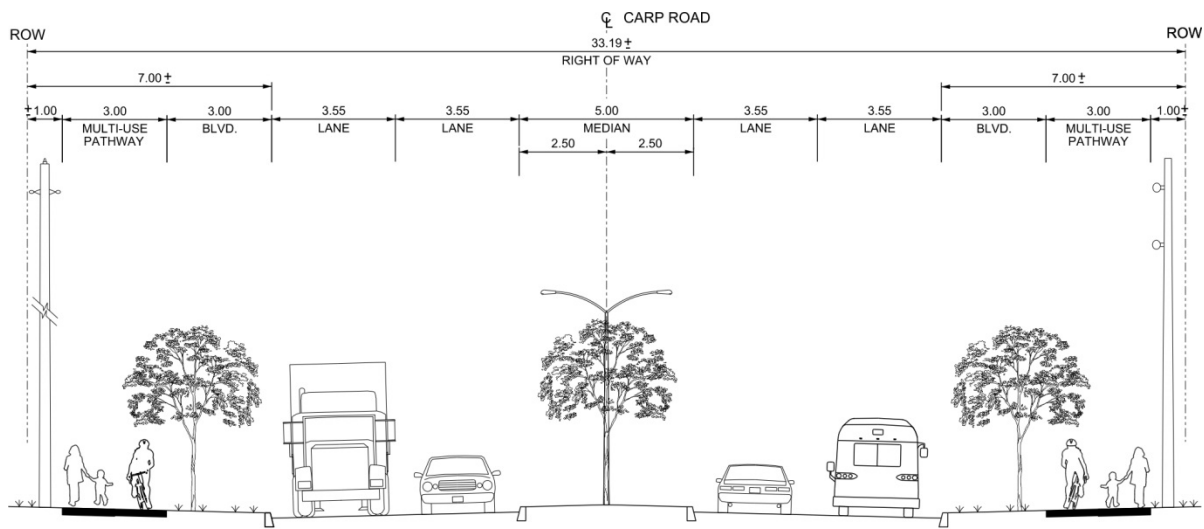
Alternative Design 6 Roundabout Intersections, Off-Road Cycling, .Wide median
